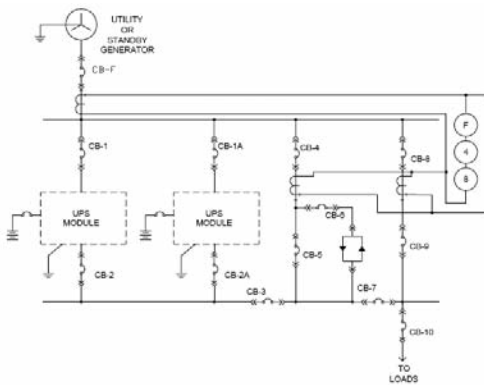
One Arrangement for Achieving MDGF Protection of Zone 1 of Fig. 8
